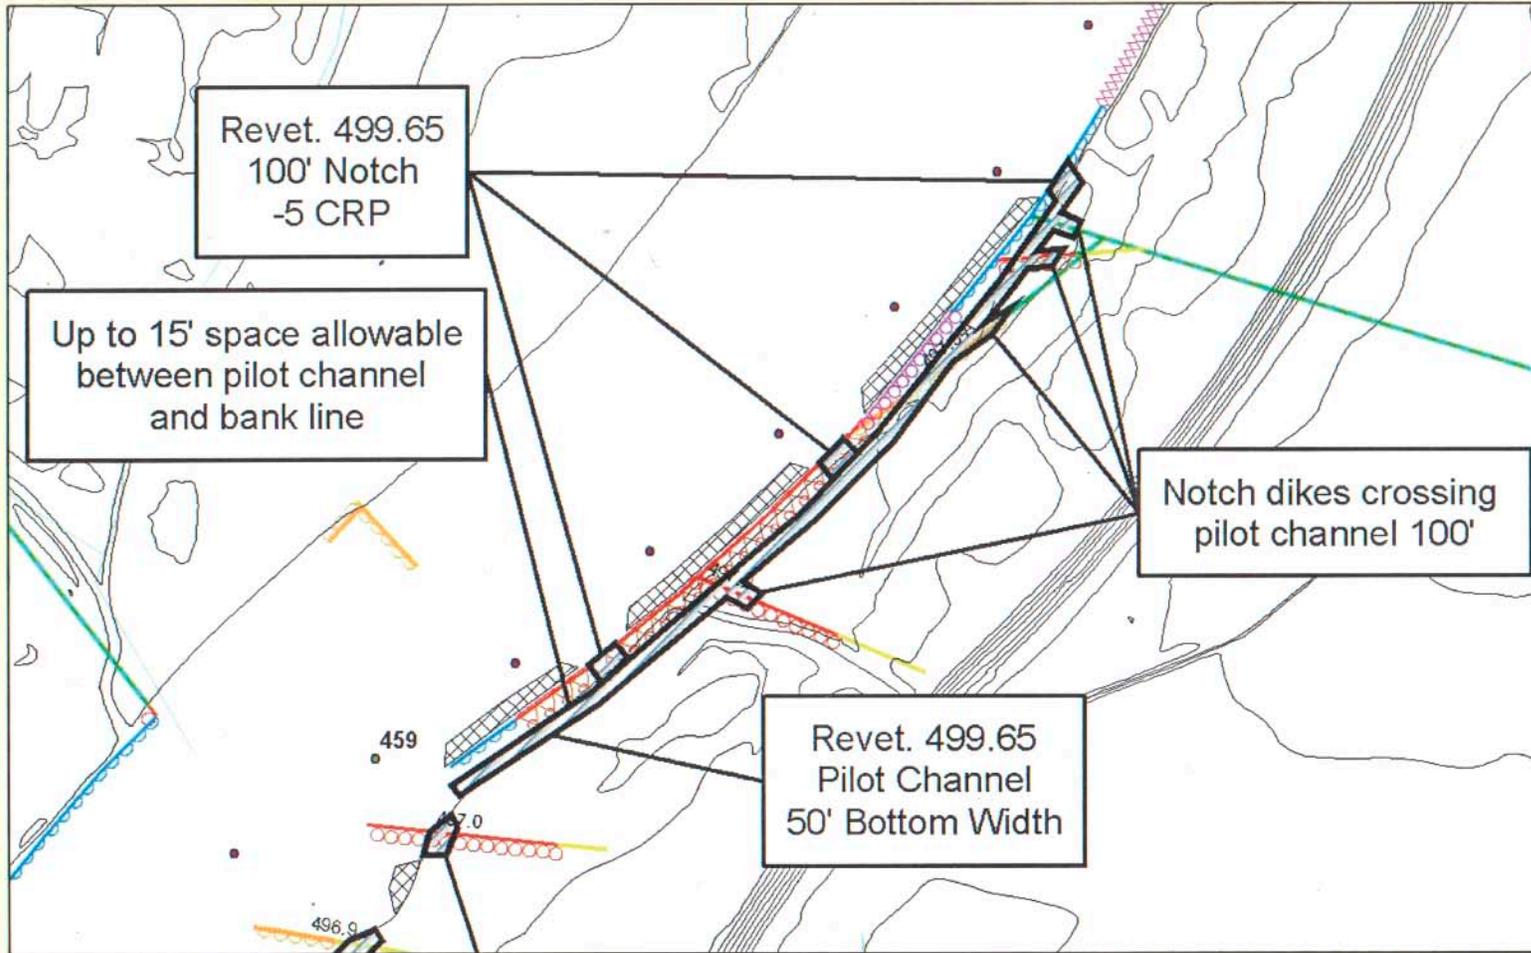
PILOT CHANNEL AND REVETMENT NOTCH DETAILS
